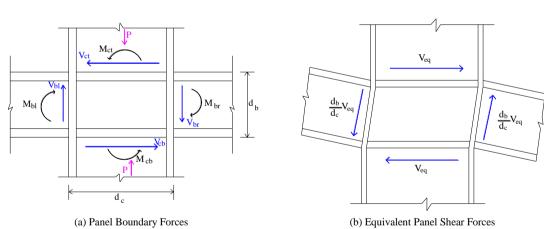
Equivalent panel shear forces and panel boundary forces [7].
